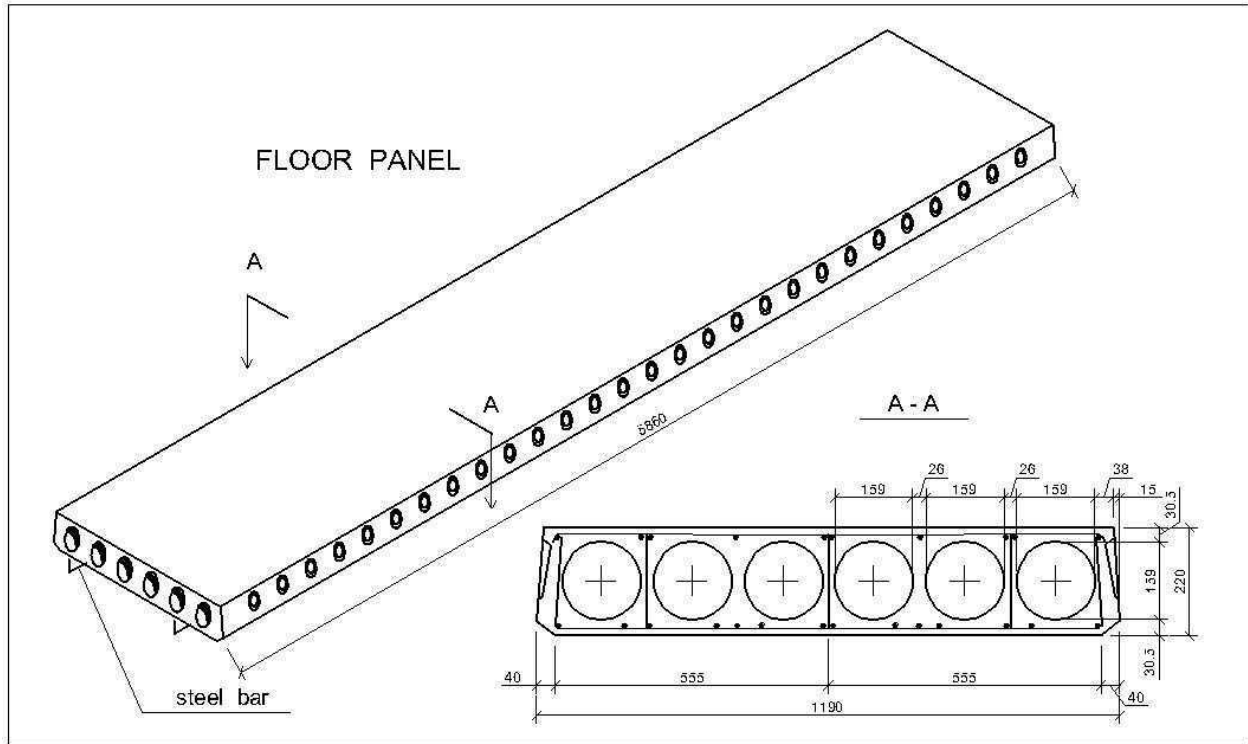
B: Precast Hollow-Core Reinforced Concrete Floor Slab (Credit: U. Begaliev and S. Uranova)
